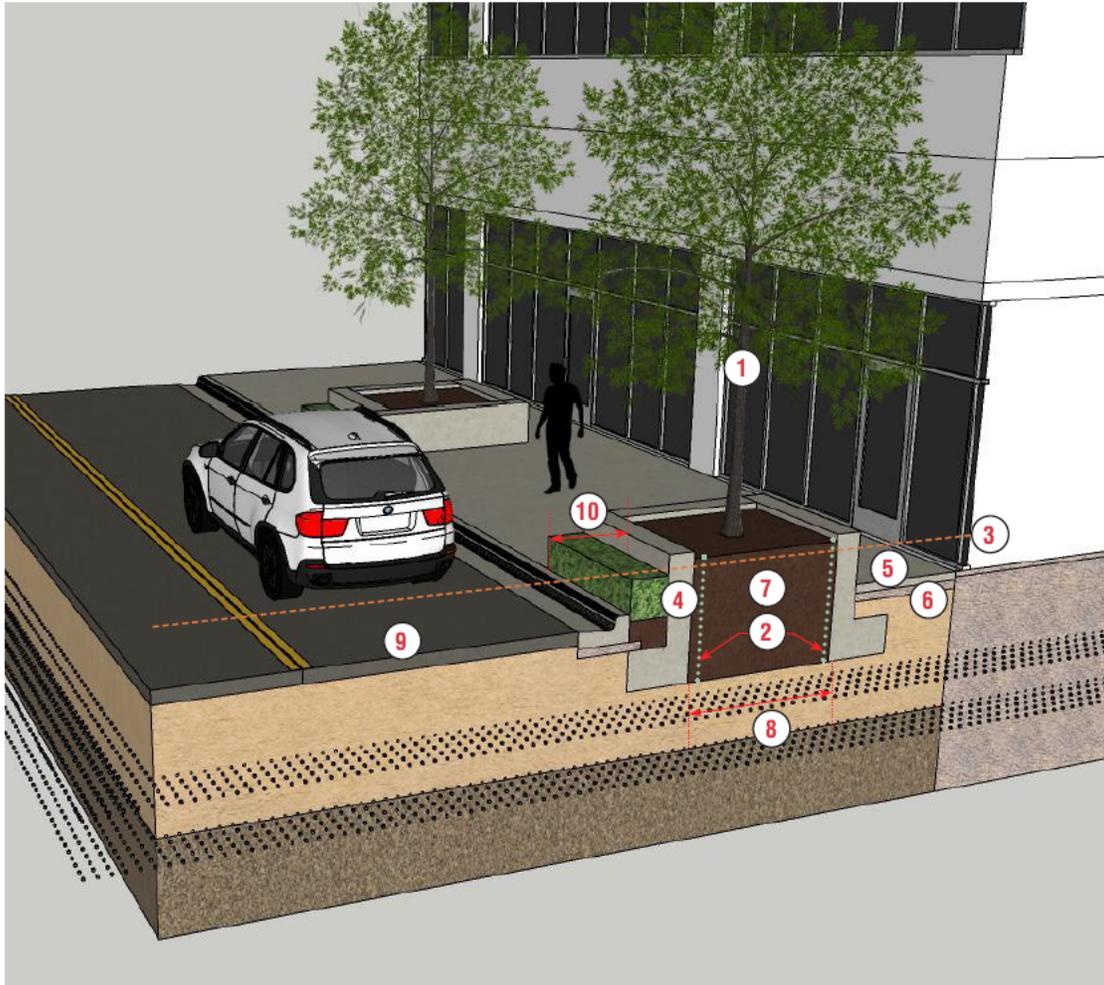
Methods for planting on all street frontages where remaining walkable area meets the minimum required A.D.A. clearance requirements, as per the Urban Forestry Master Plan adopted in 2020.
